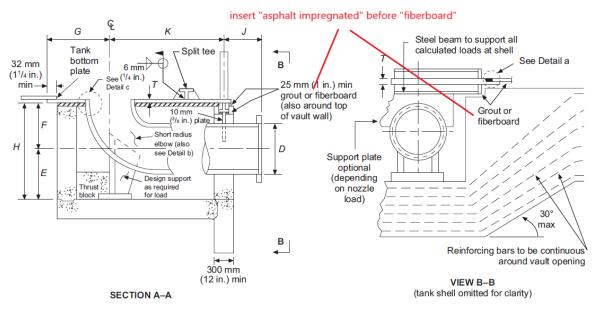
Example of Under-Bottom Connection with Concrete Ringwall Foundation
